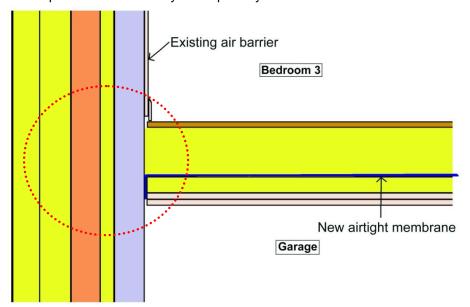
Discontinuity in the primary air barrier between the new garage ceiling and the wet-plastered wall finish in bedroom 3 at the gable wall.
